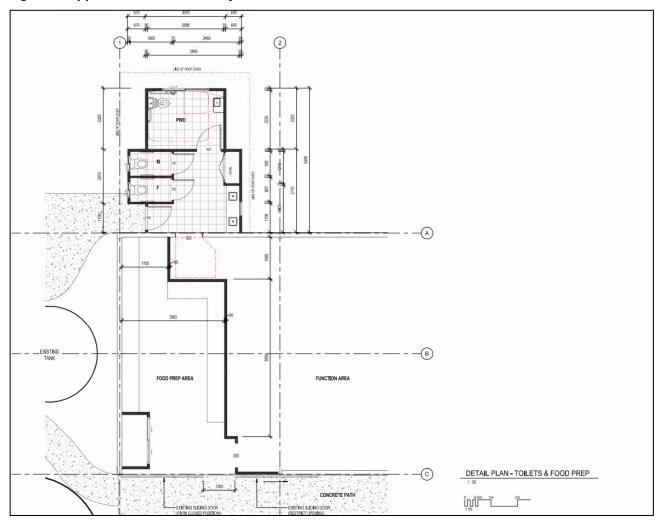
Approved Toilets and Food Prep Floor Plan for Function facility
